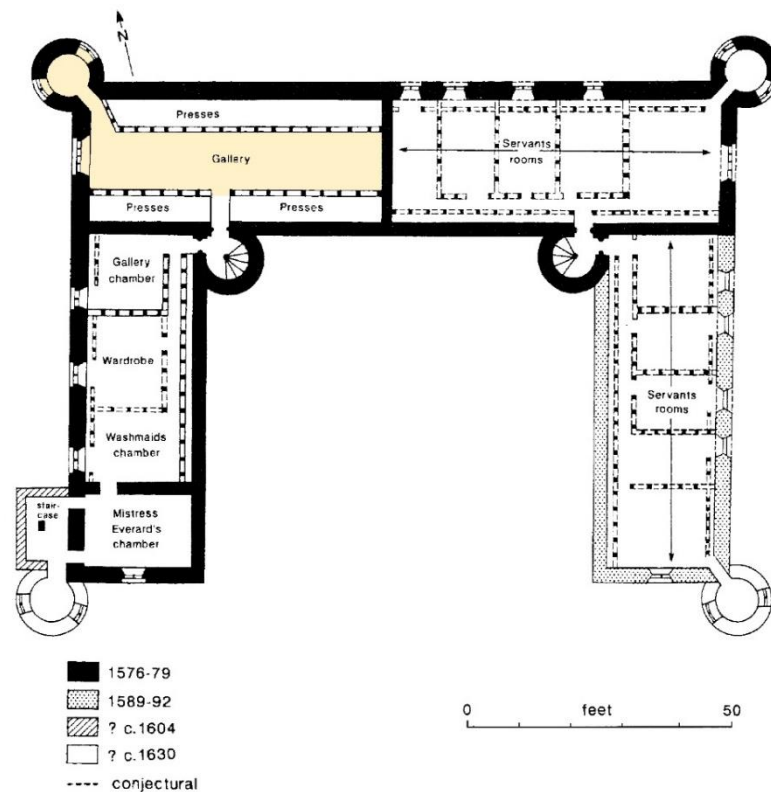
Location of Actual Gallery, on reconstructive plan of attic floor, Stiffkey Old Hall (Smith, 2002, fig. 3)
